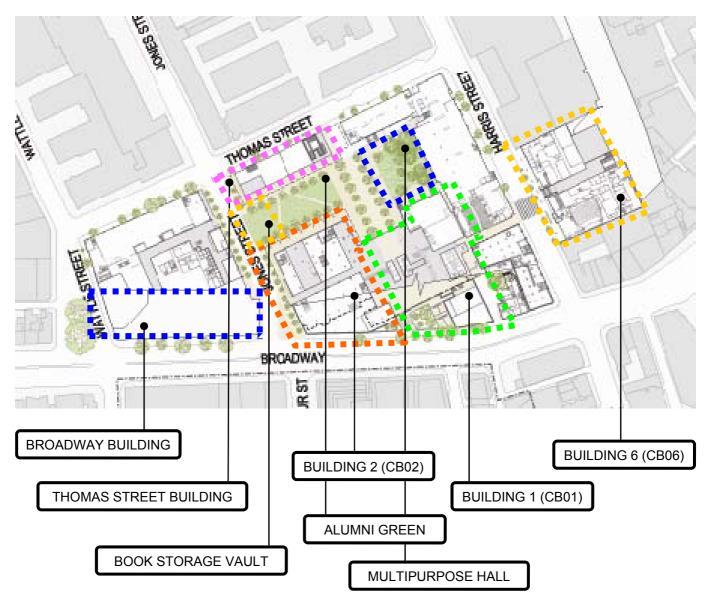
(ABOVE) A campus site plan showing the extent of development included in the UTS City Campus Broadway Precinct concept plan. Refer to the architectural concept plan documents for full extent of demolition and construction.
